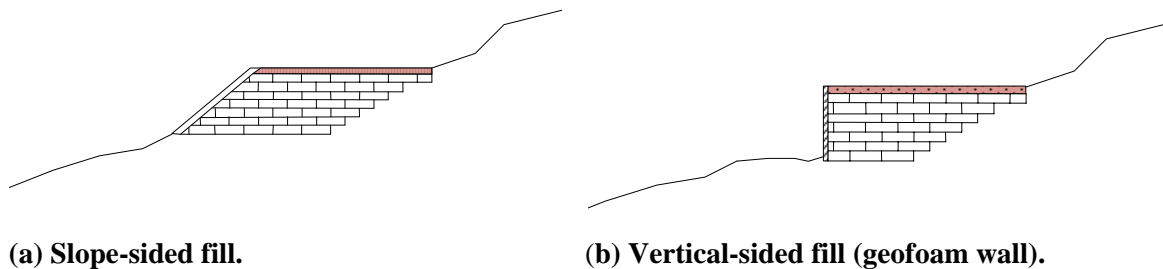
Typical EPS-block geofoam applications involving side-hill fills.
